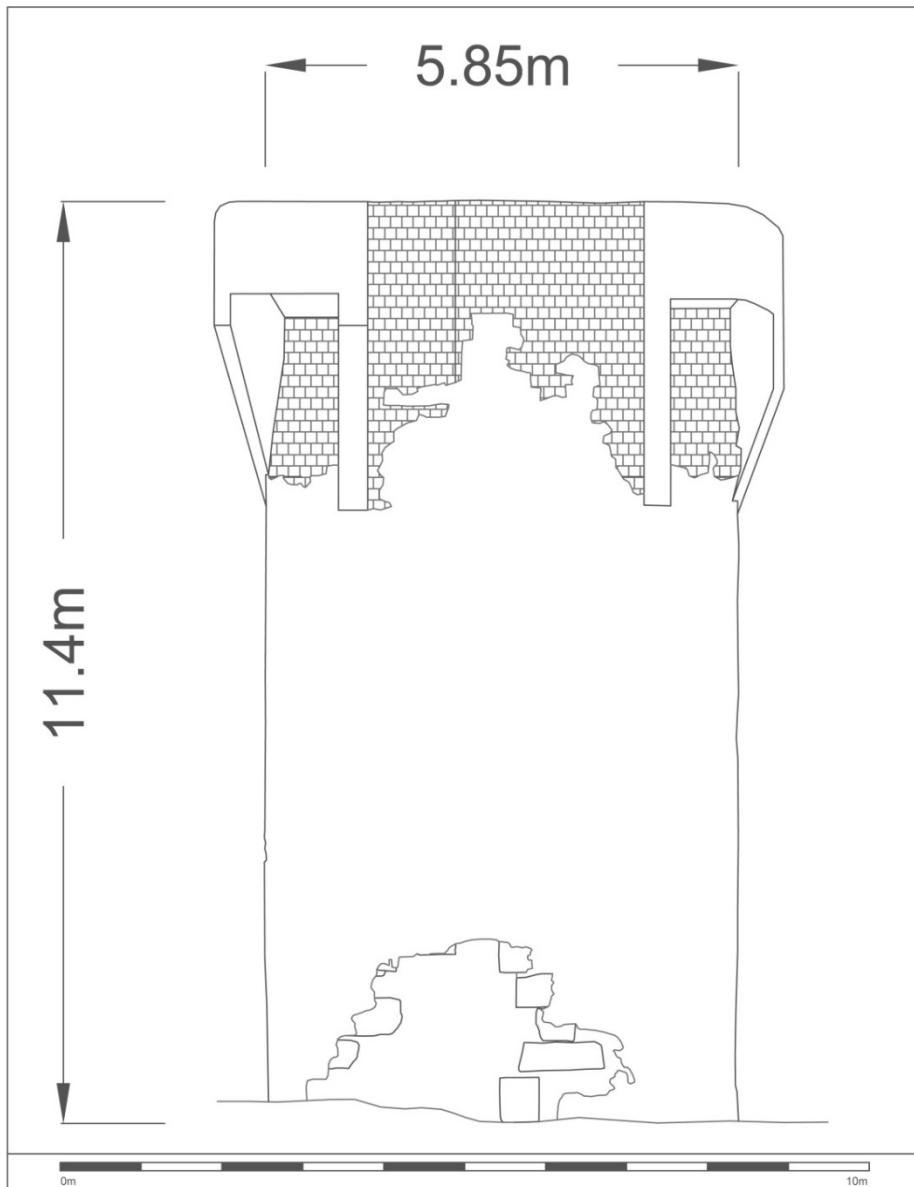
External elevation of the north-east wall of the signal tower at Inisheer Signal Station.
